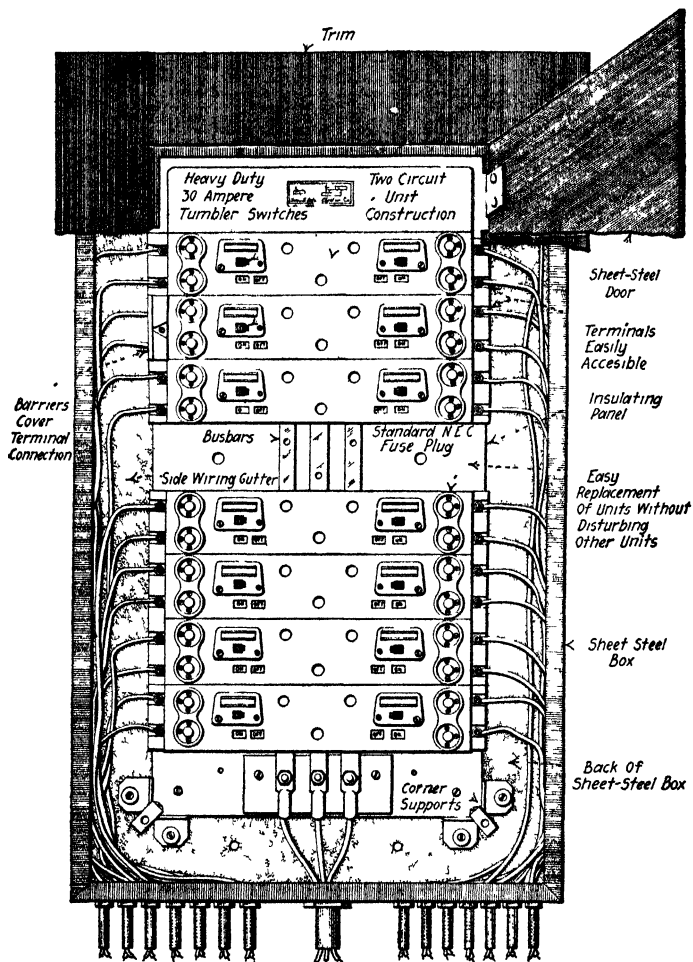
Showing panel box with dead-front type panel inserted. (Frank Adam Electric Co., St. Louis, Mo.)^{*}
